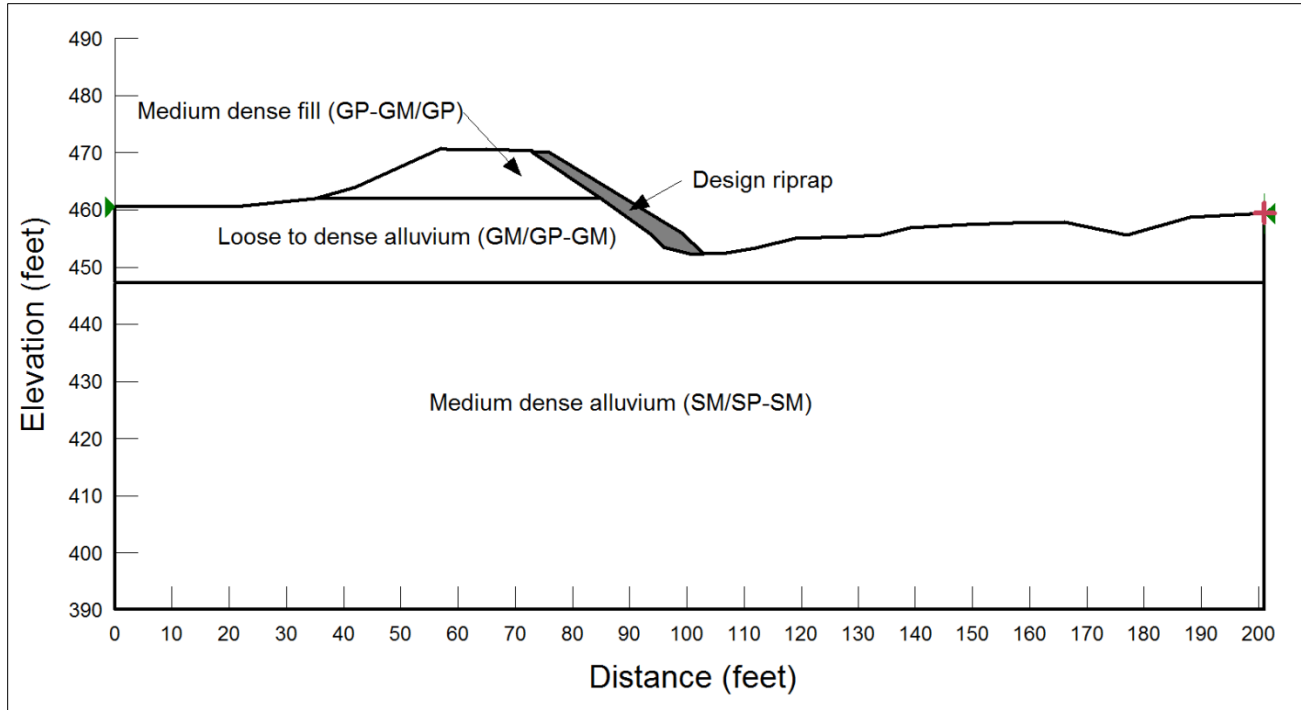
Levee Cross Section, Critical Section Location G-23
